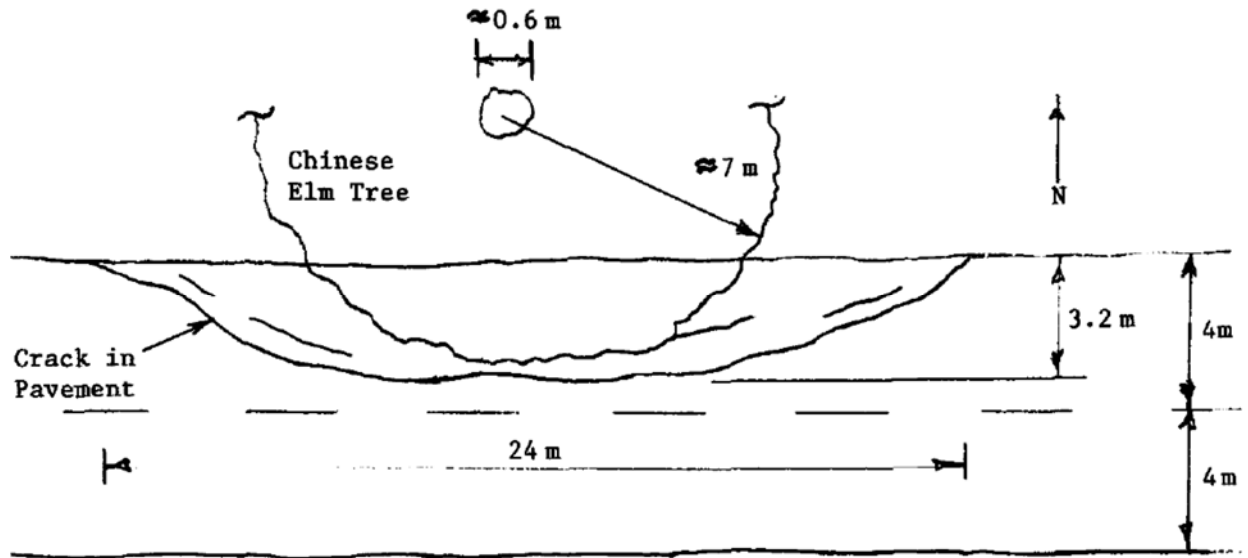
Arc-shaped Cracks in HMA Pavement Along 32nd Street, Stillwater, OK (Snethen 2001)
